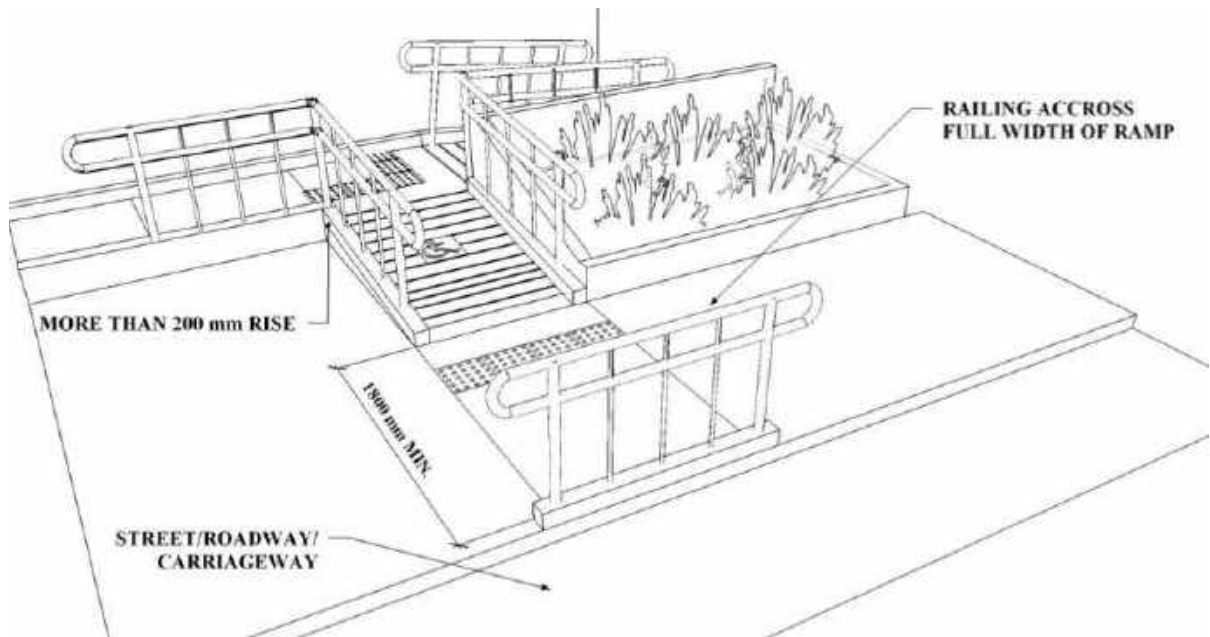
Image above is a 3D view of an accessible ramp perpendicular to a street with protective handrails at the edge of the sidewalk with width same as the accessible ramp
